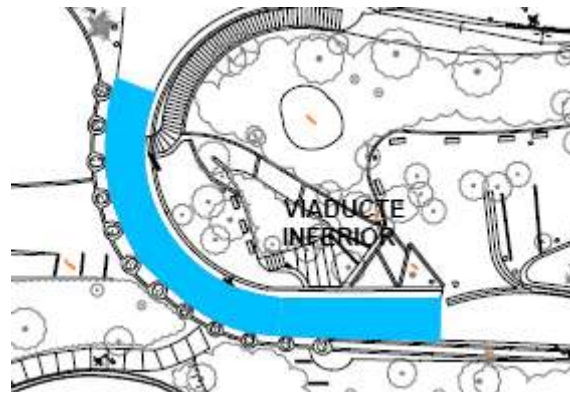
Plan view of inferior viaduct (BIS architects)
